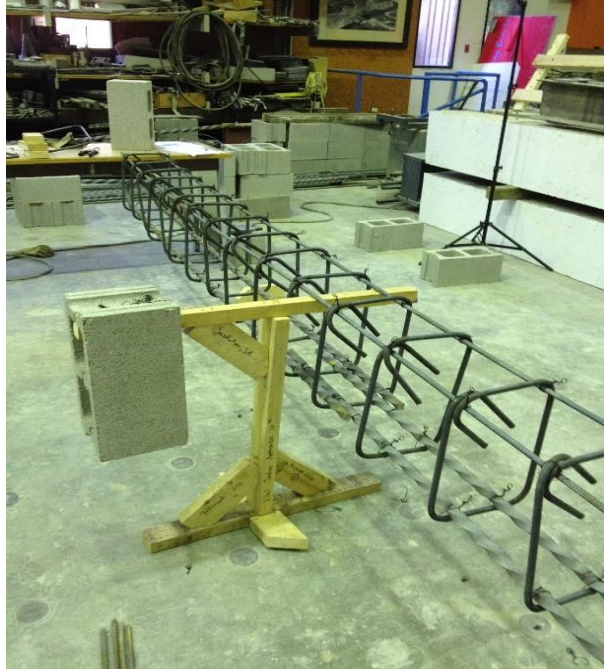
Construction of the Reinforcing Cage for Specimens Reinforced with Ransome Bars
